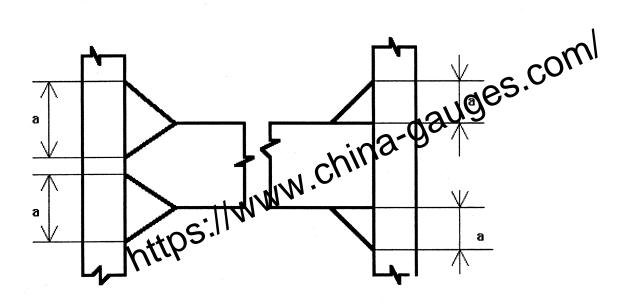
Definition of "a" for types of weld 10 and 11
